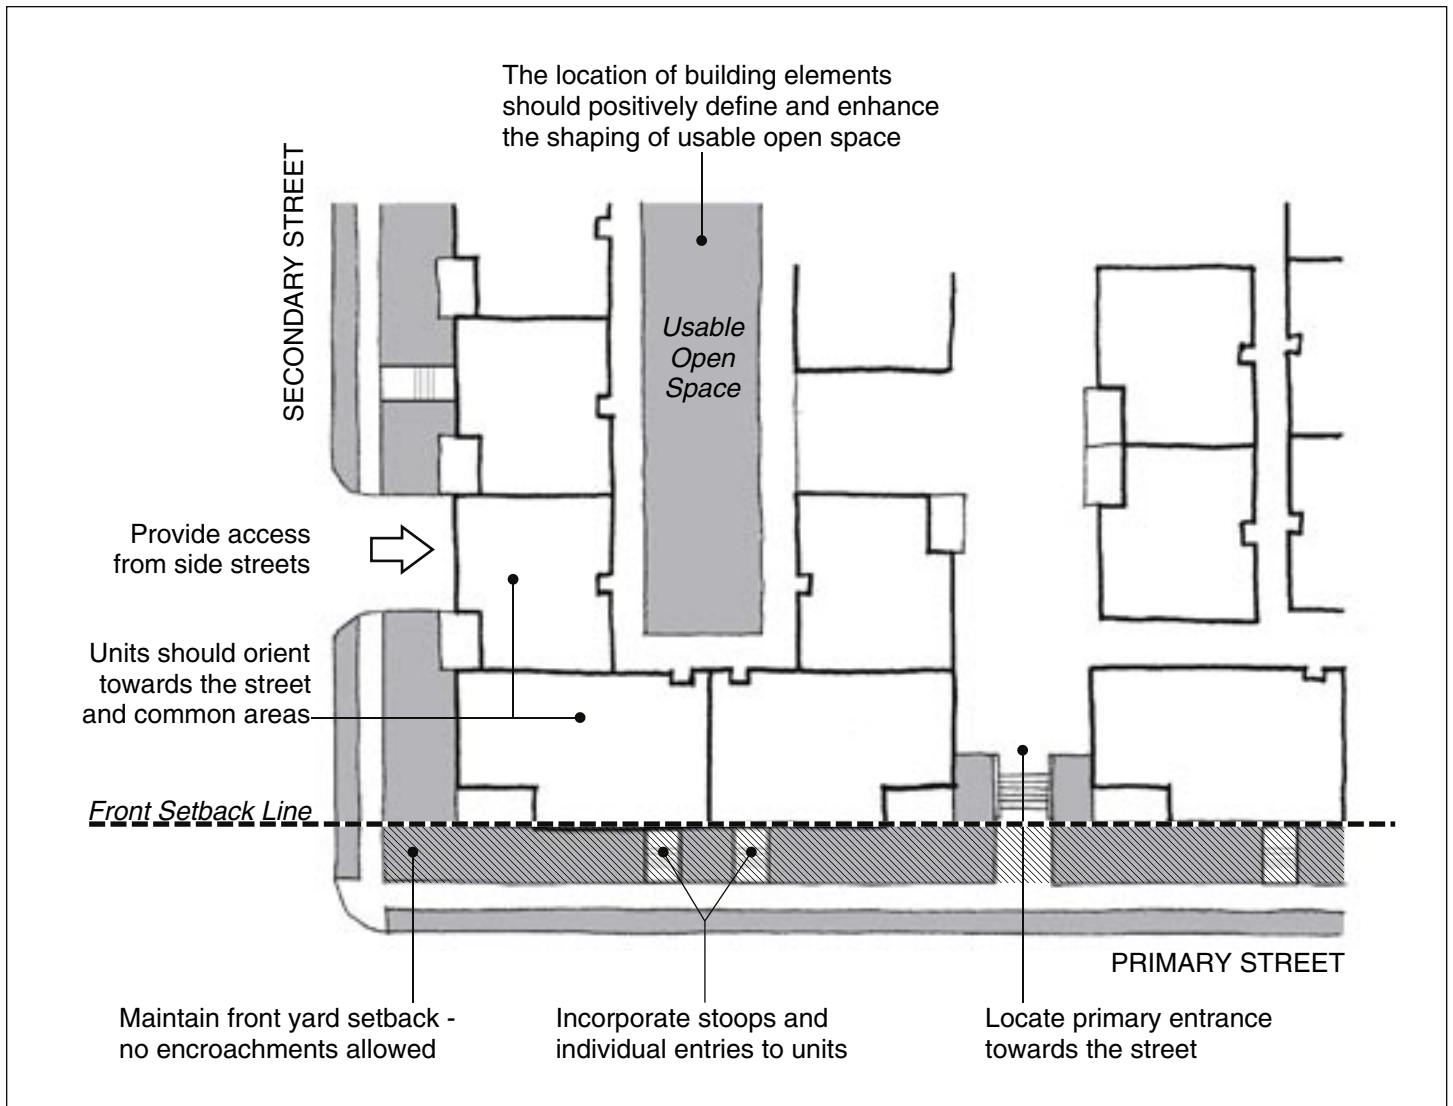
Multi-Family Districts - Orientation and Site Planning Issues
